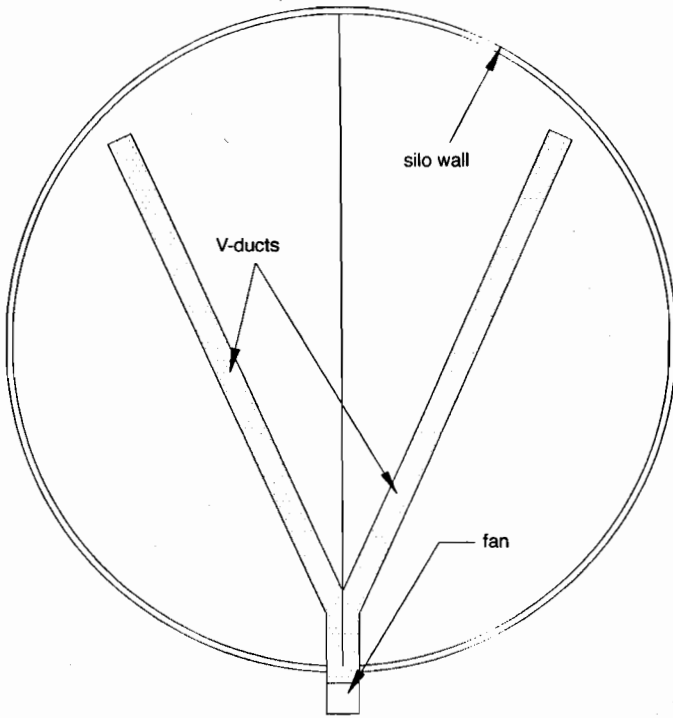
Typical V-duct arrangement in a flat-bottom silo.
